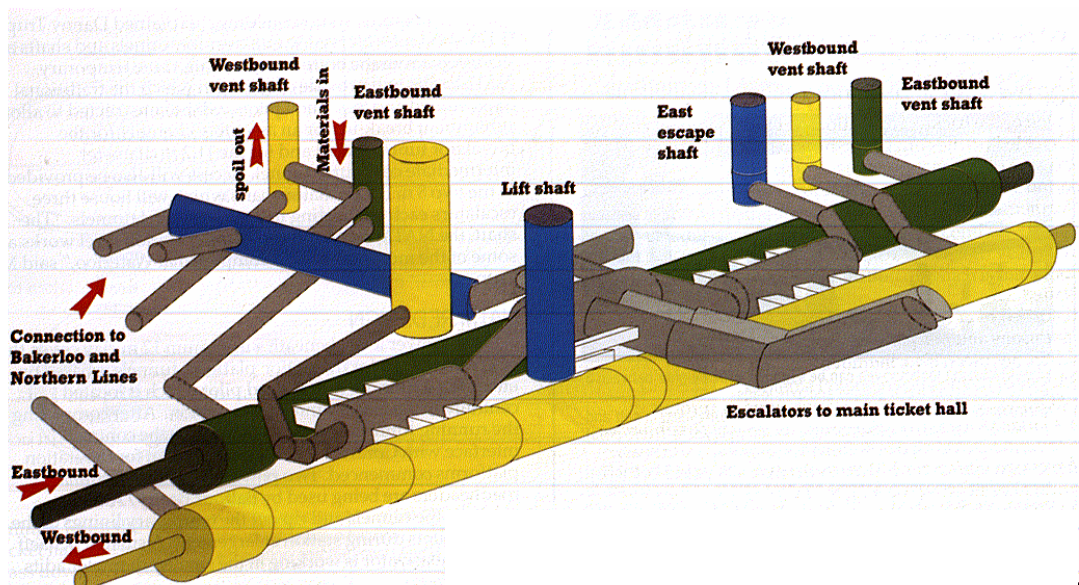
Tunnelling works under Waterloo Station, London, for the Jubilee Line Extension (World Tunnelling, Feb. 1996)
